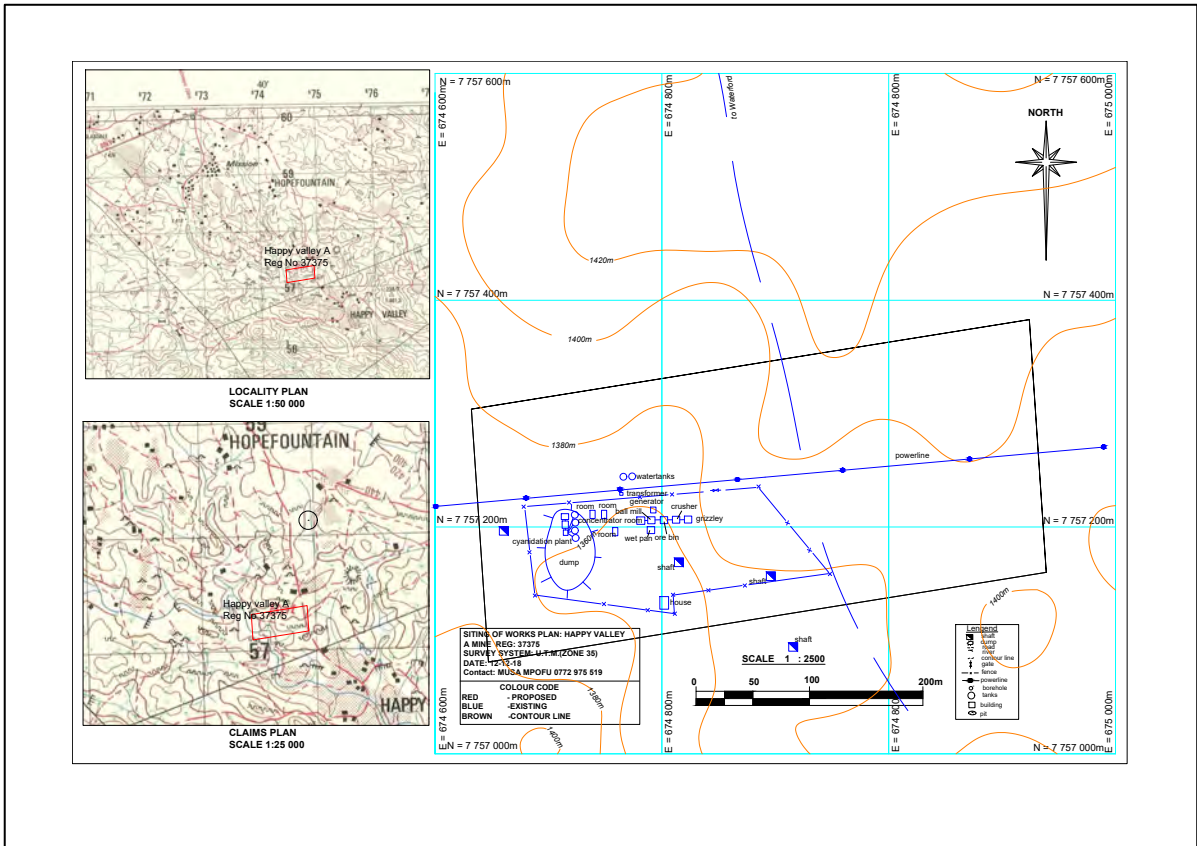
Siting of Works Plan approved by the Ministry of Mines.
